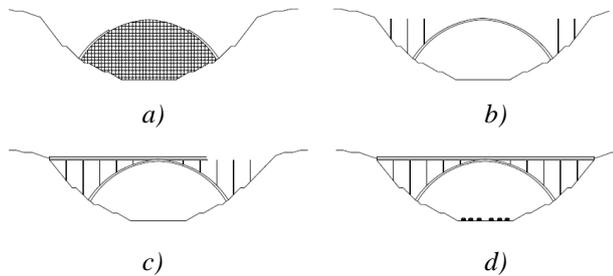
Construction process: a) Arch sections attached. b) Spandrels cast. c) Deck added. d) Finished bridge.
